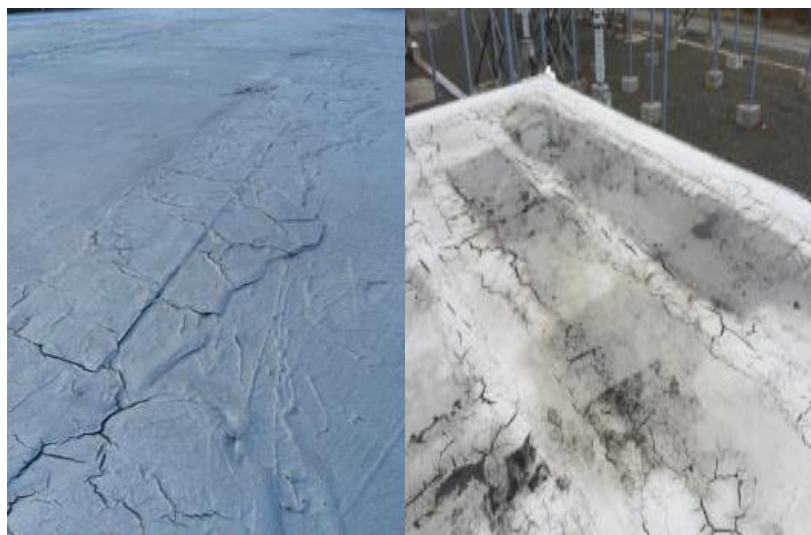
Terminal Station Control Buildings (Come by Chance and Sunnyside) Showing Cracking and Deterioration of the Roof Membrane System
